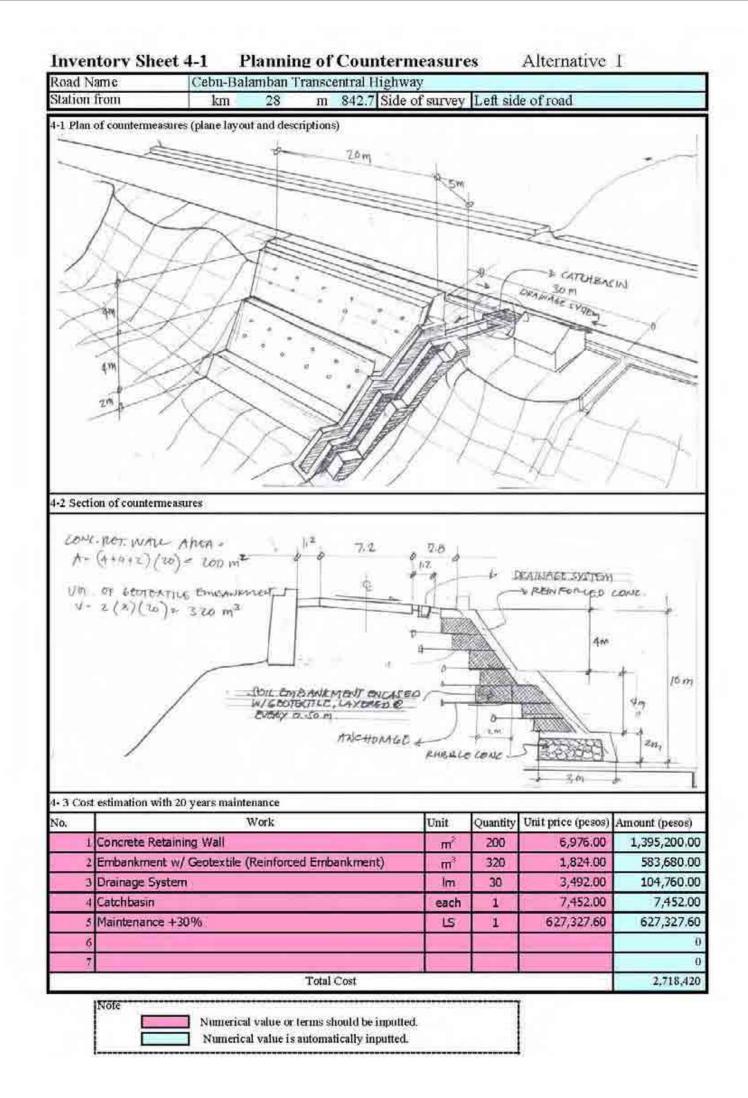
Example of Inventory Sheet 3: Planning of Countermeasure Alternative I for Road Slip
